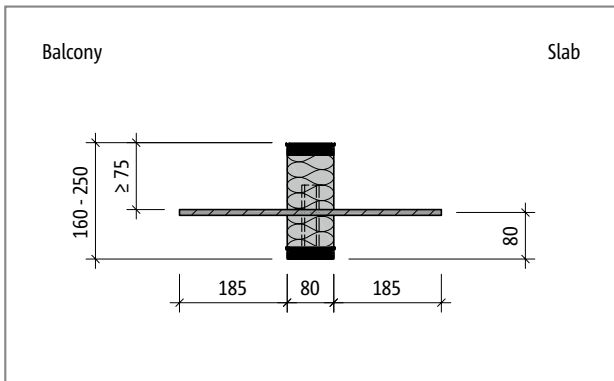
Schöck Isokorb® T type H-NN1: Product section
